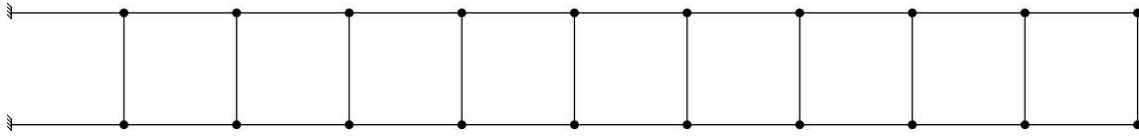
Exemplary ten-story, one-bay frame structure.
